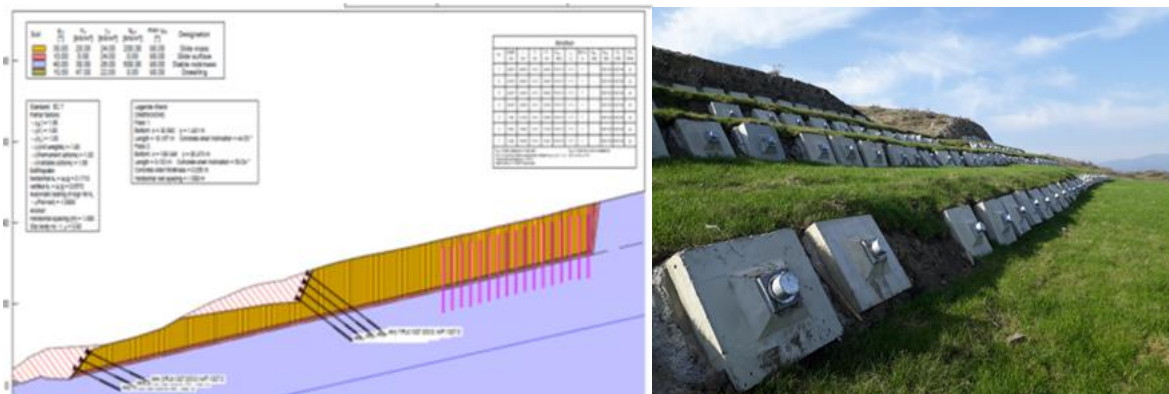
Project of anchor reinforcement of the Vashlijvari landslide slope and its fragment
